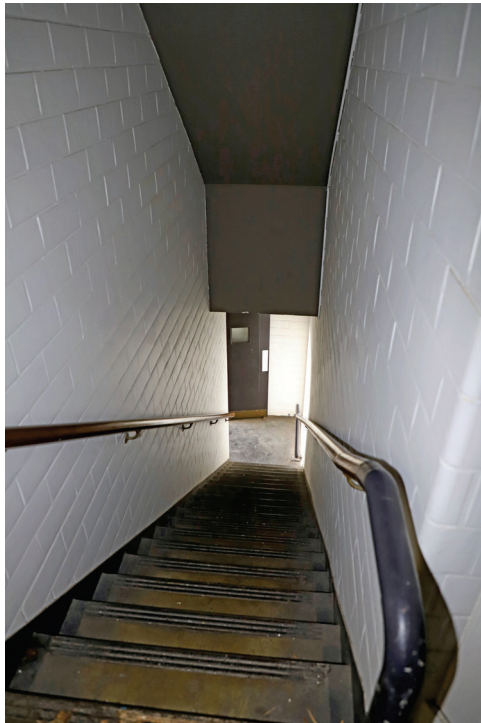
North central stair, looking down from the fourth floor. Source: nffty.org.
